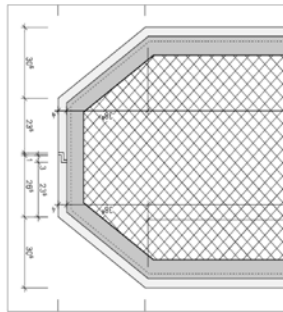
Strengthening of an industrial floor (Bruhwiler and Denarie, 2008)
